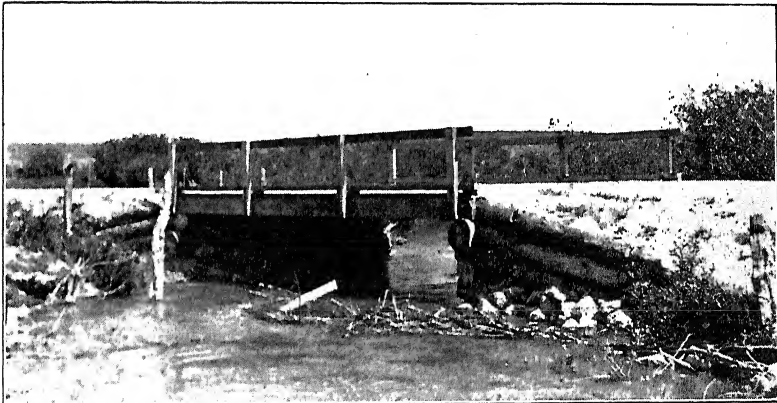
Usual type of timber stringer bridge (unimportant roads).
